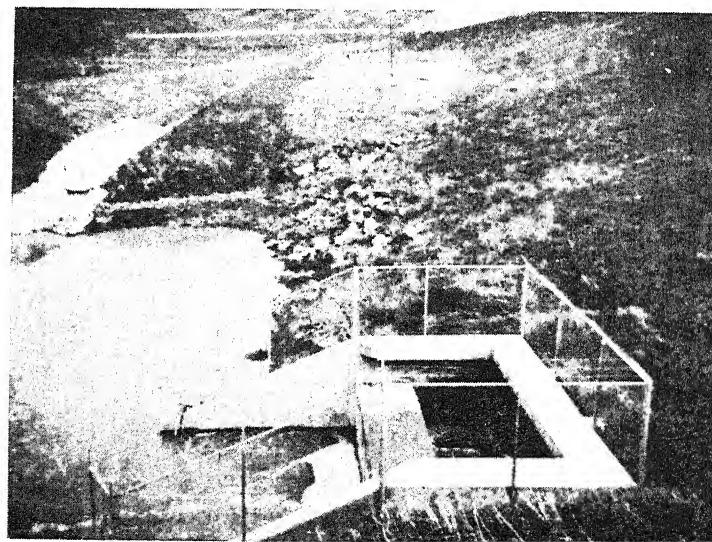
1/29/69 2:45 p.m. 0.5' below soffit.
